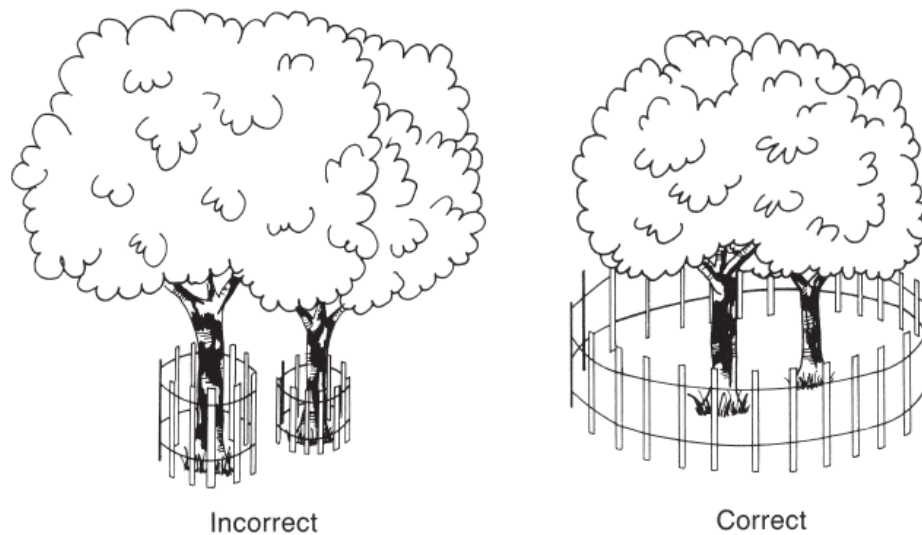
A: Construction barriers should be installed at the drip line of the tree branches. Source: NCDEQ (2013).
